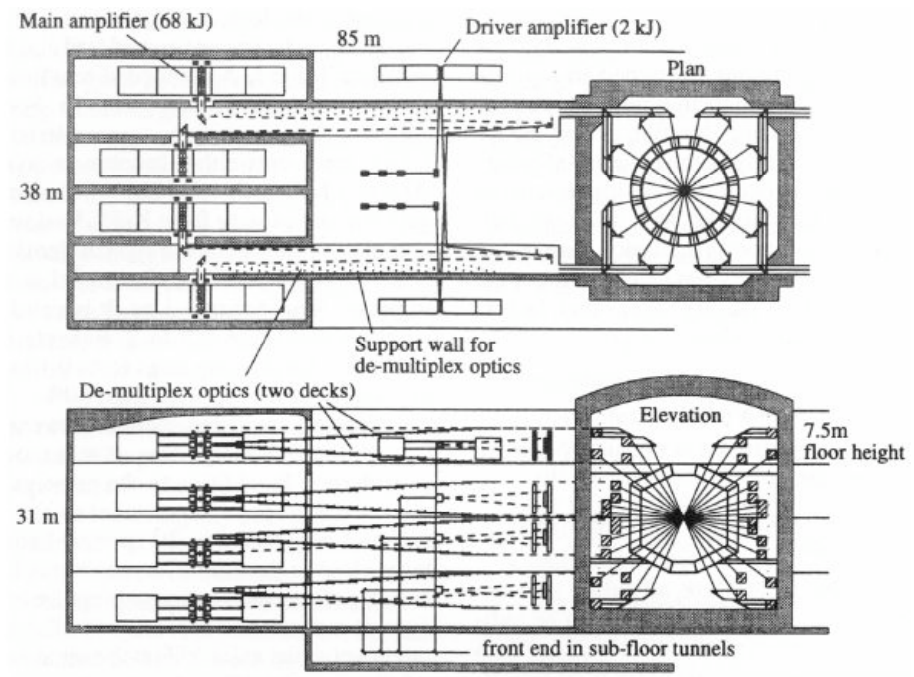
Plan and elevation of a 2-MJ KrF laser facility [17]
